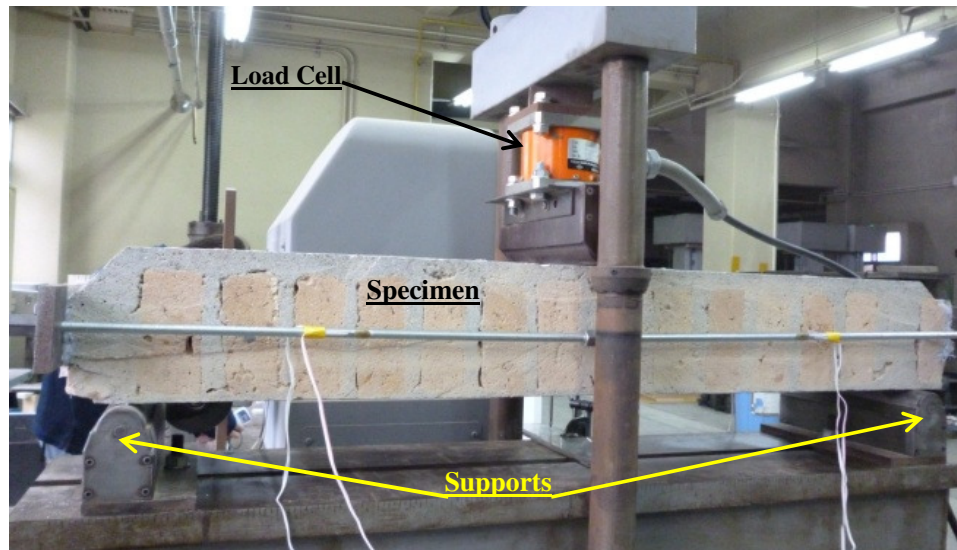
Front view of out-of-plane loading system for three-point bending test
